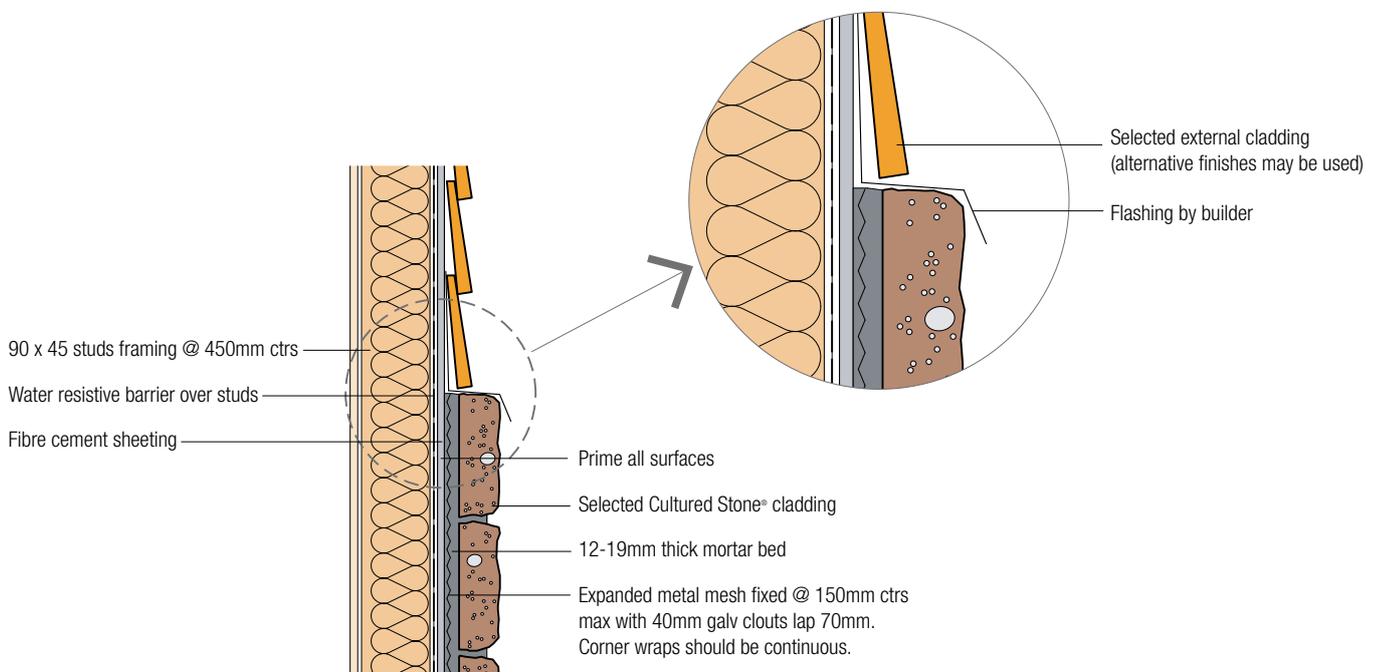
Typical Cladding Transition - Section (Dwg # CS-06.01)
